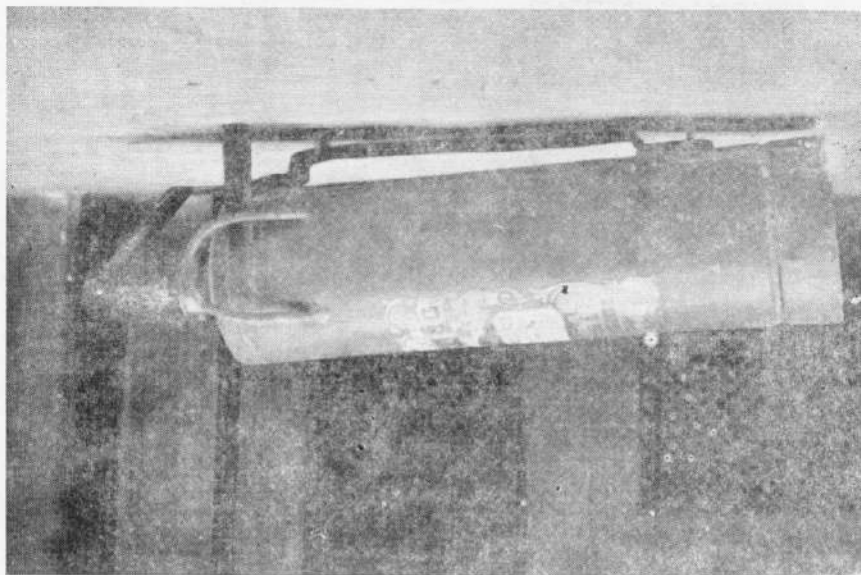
Detachment of fire extinguisher from the wall inside police station Building at Leo village.
